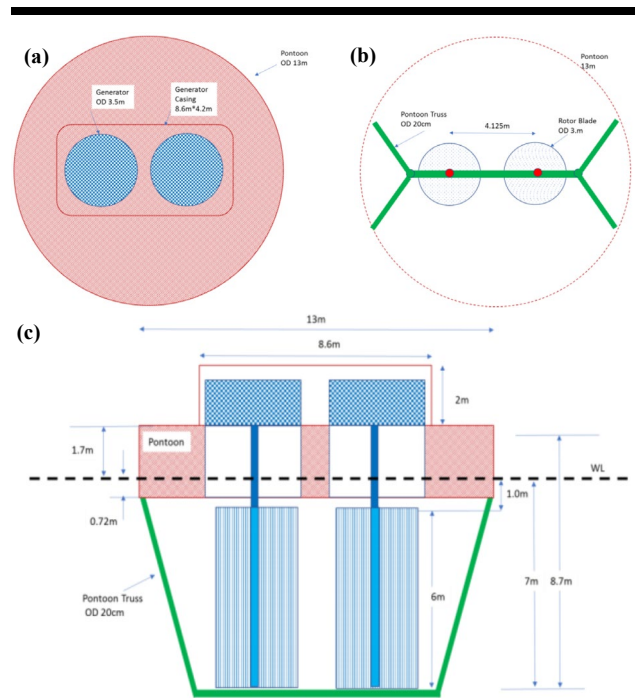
Pontoon platform configuration (plan view at deck level (a), plan view at keel level (b), and elevation view (c)).
